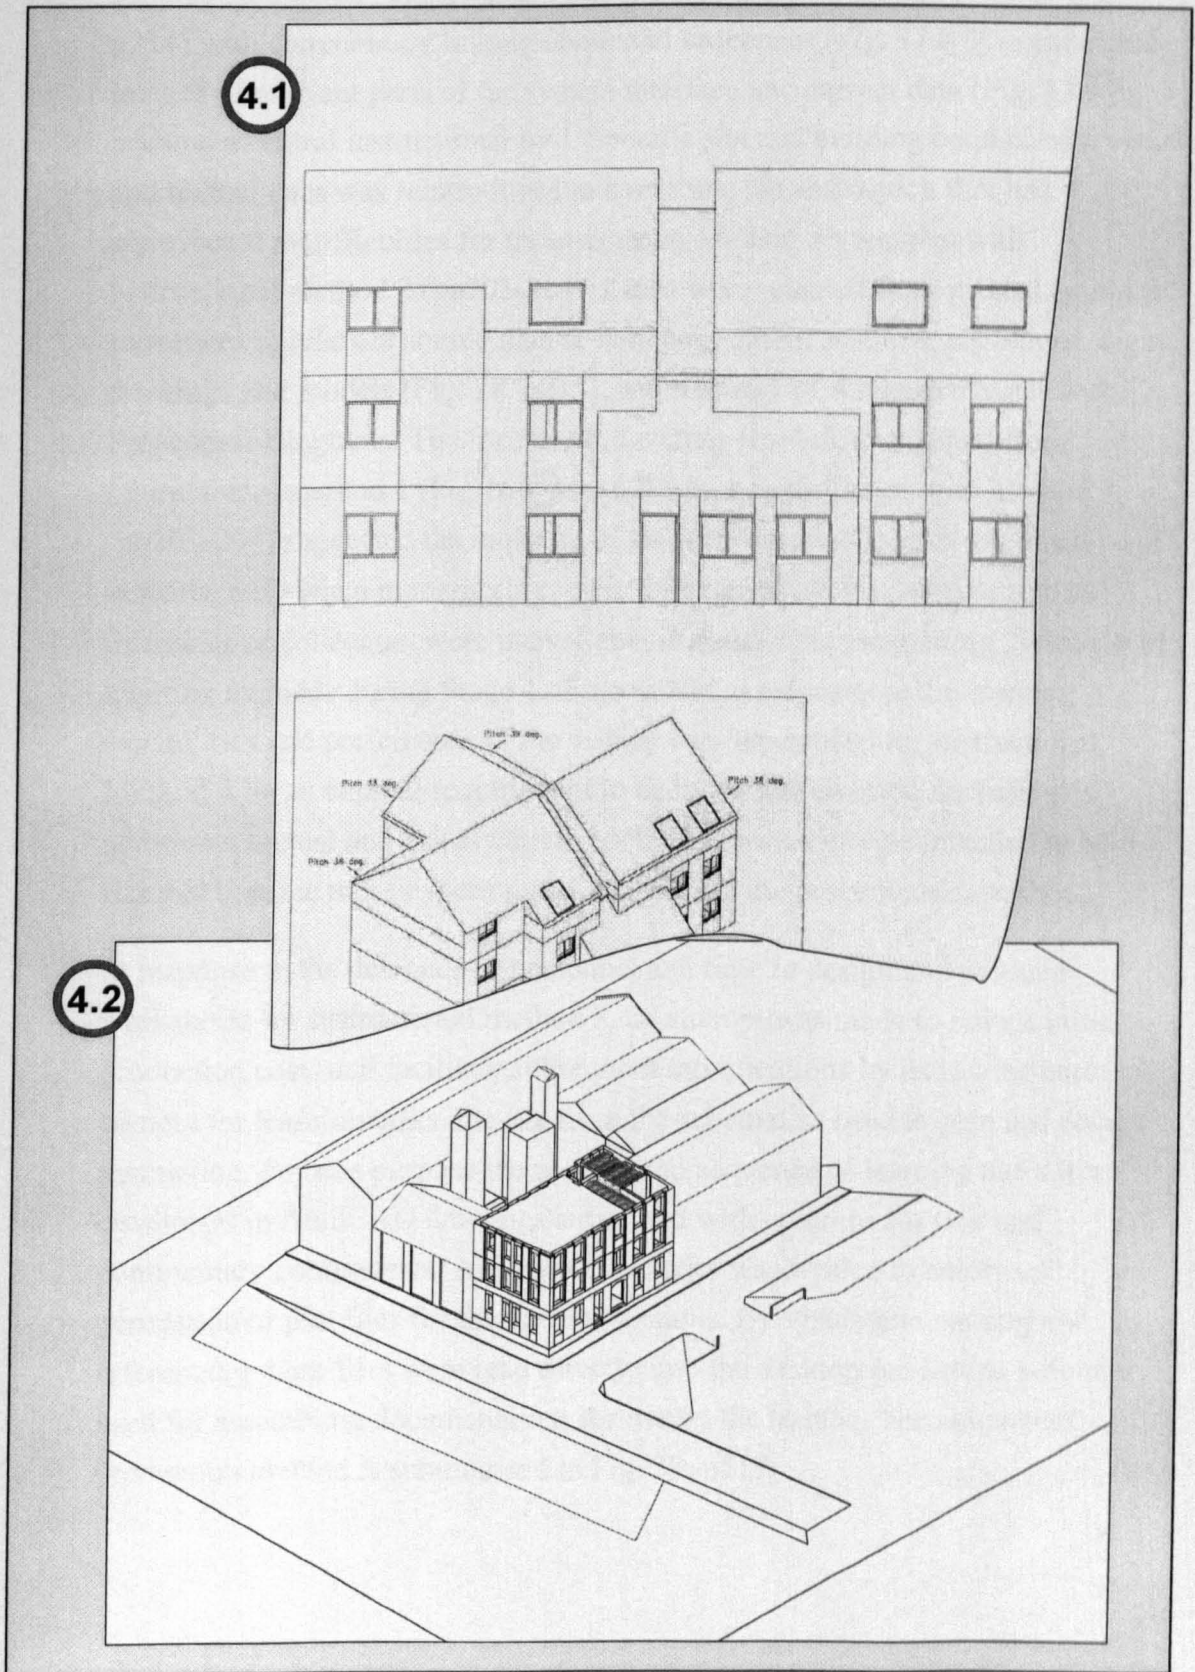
Instructional method 3 source data: Hard copy plans, sections and elevations (4.1), Digital drawings and models (4.2)
